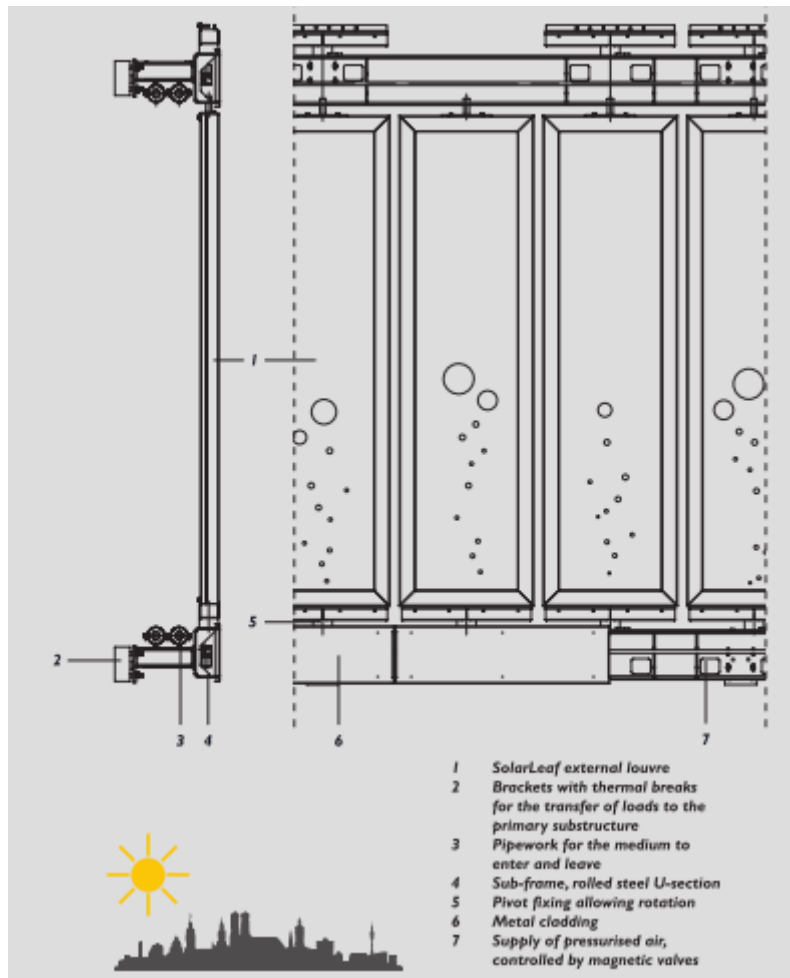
Detail of the solarleaf façade (Colt et al., 2013)
